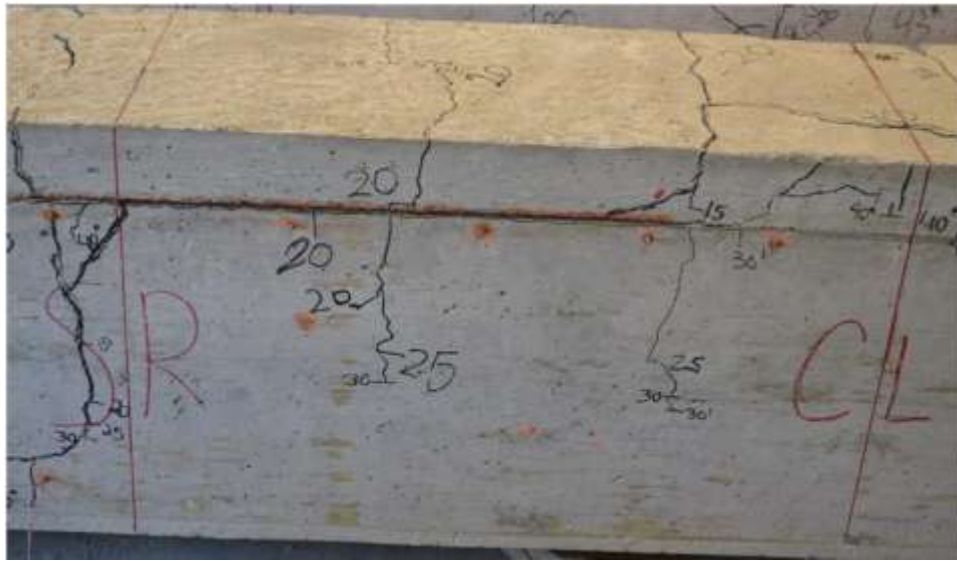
Beam 3 failure with wide horizontal cracks along cold joint
